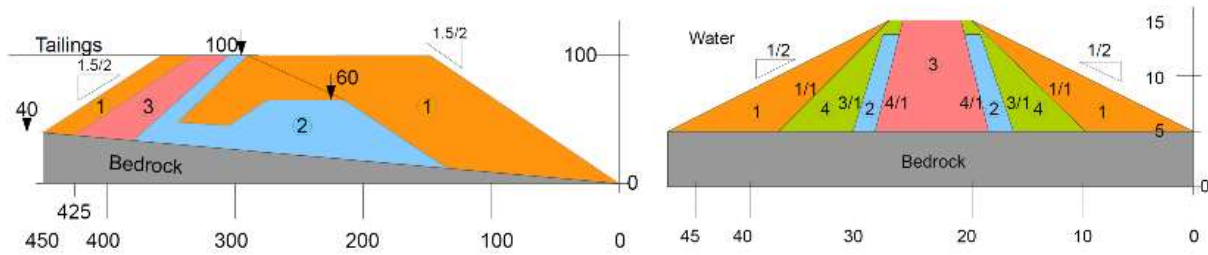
(Left) Dam 1A cross section: Raise at altitude 100m of Dam 1 (final height 162m) (Right) Cross section of Dam 2, a water retention dam.
